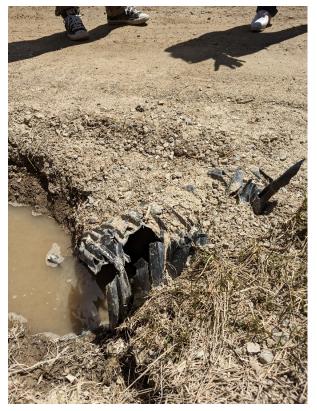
Upstream side of existing cross culvert at Sherwood Lane and Starlit Lane. Looking south toward Starlit Lane.
